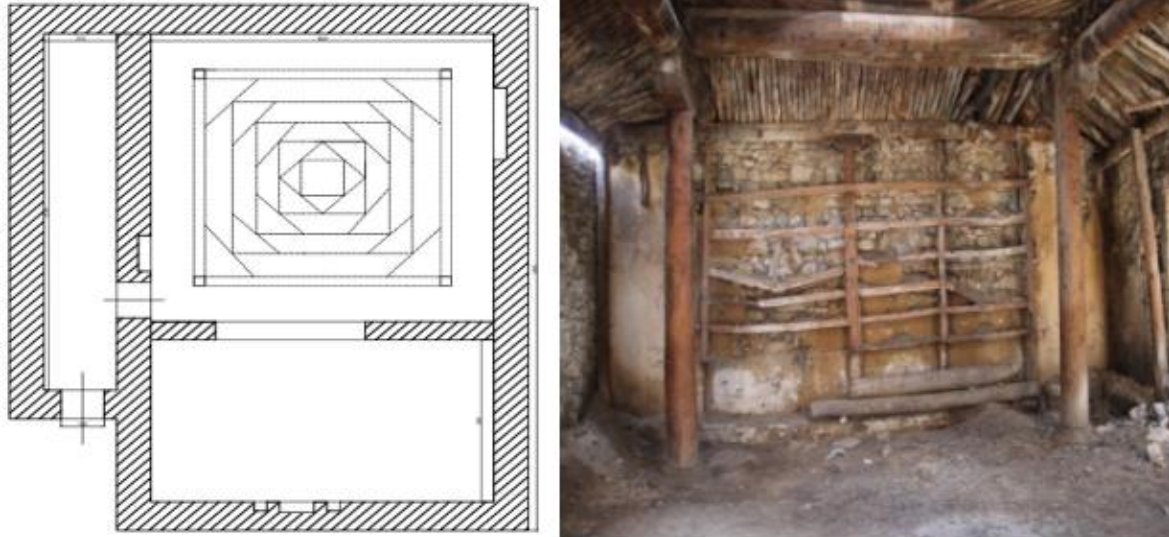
Erzincan-Çayırılı-Başköy Dursun Koçgil's Village Room, Left: Plan of the Room, Right: Interior of the Room (Naldan, 2020, pp. 249-263).
